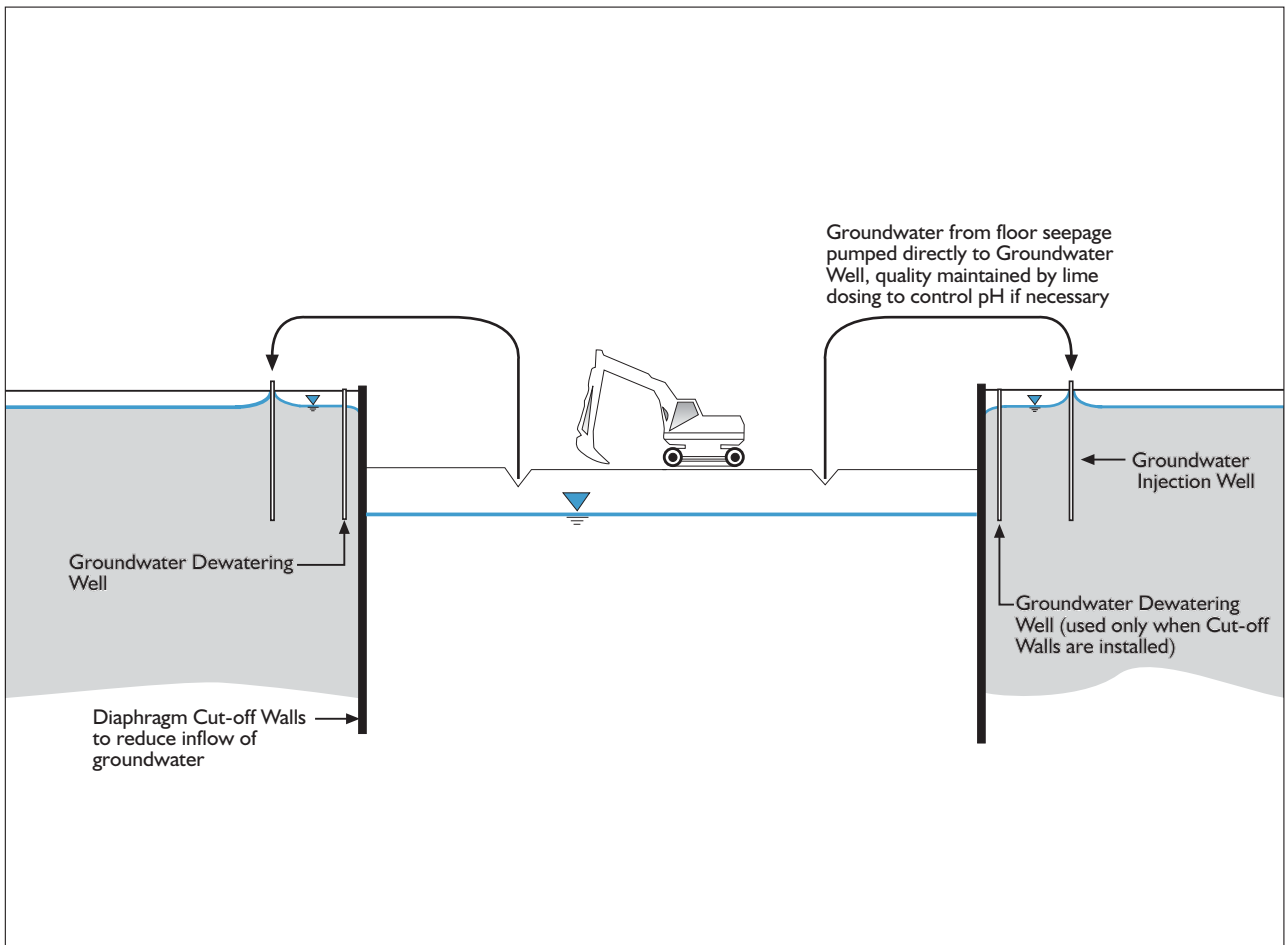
Indicative Construction Method for Cut and Cover Tunnel
